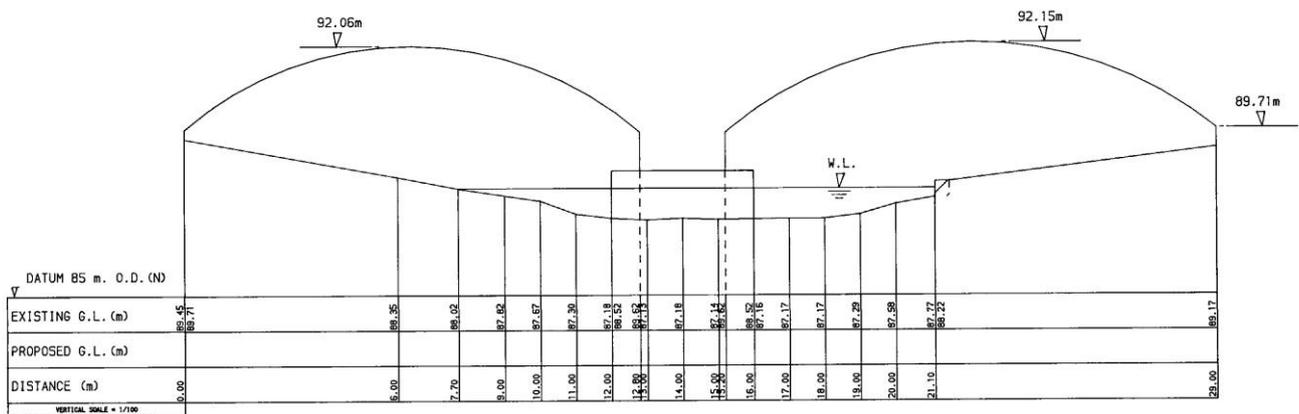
Cross Section of the River Calder at New Rd Bridge from 1960's scheme
